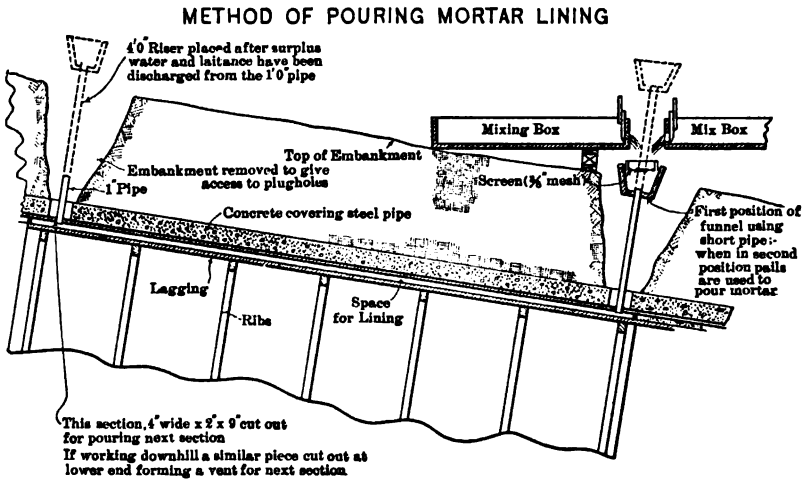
Method of Grouting 2-in. Mortar Lining for Steel Pipe Siphons.
